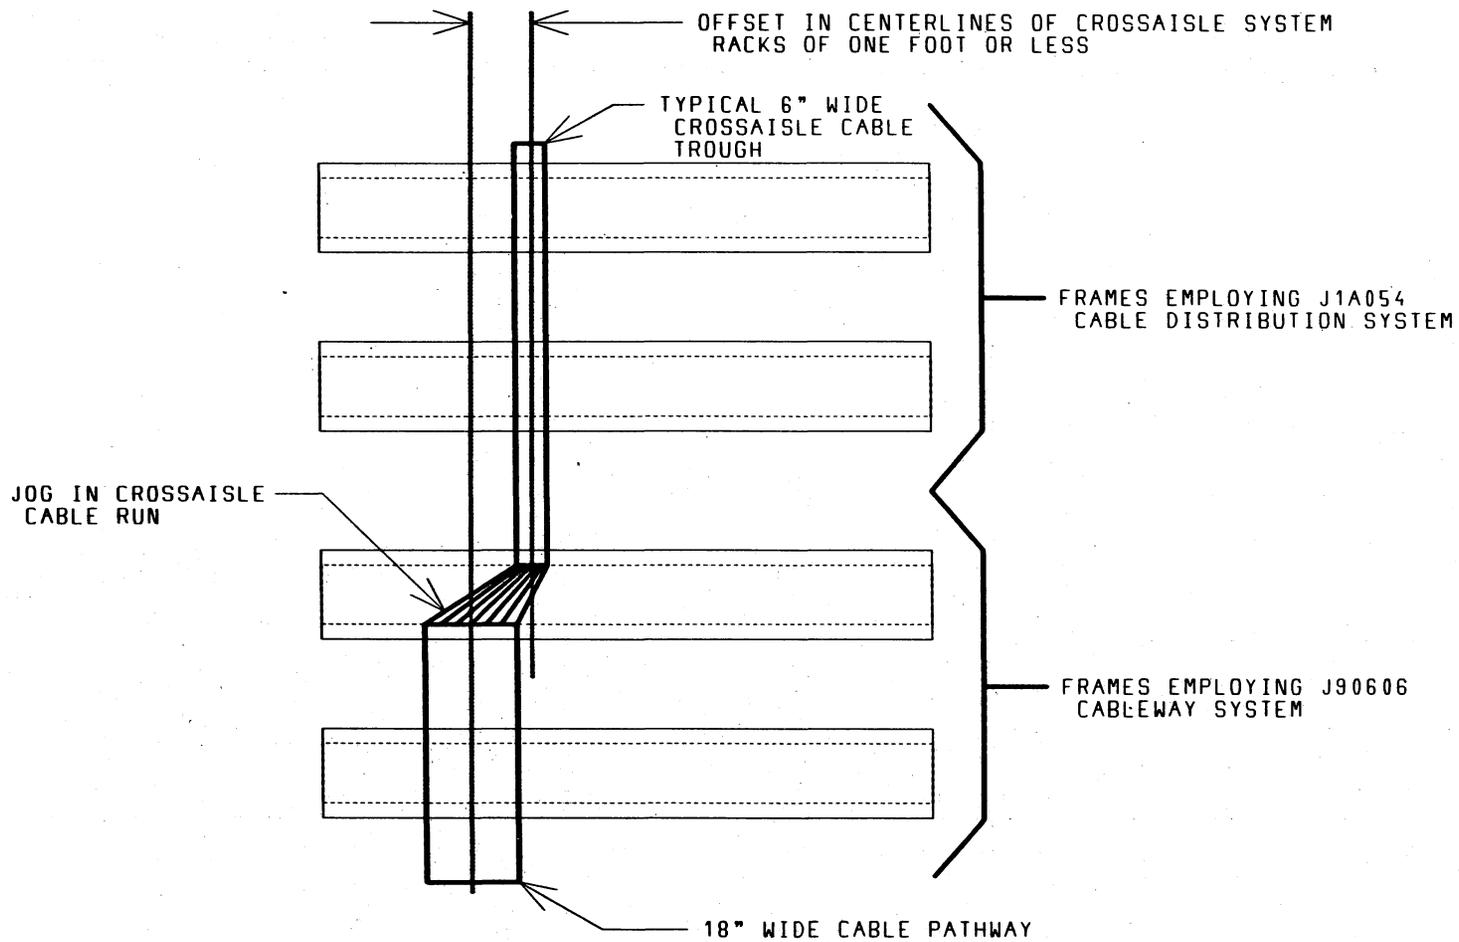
Interface Between J90606 Cableway and J1A054 Cable Distribution System with Offset of 1 Foot or Less in Cable Pathways
